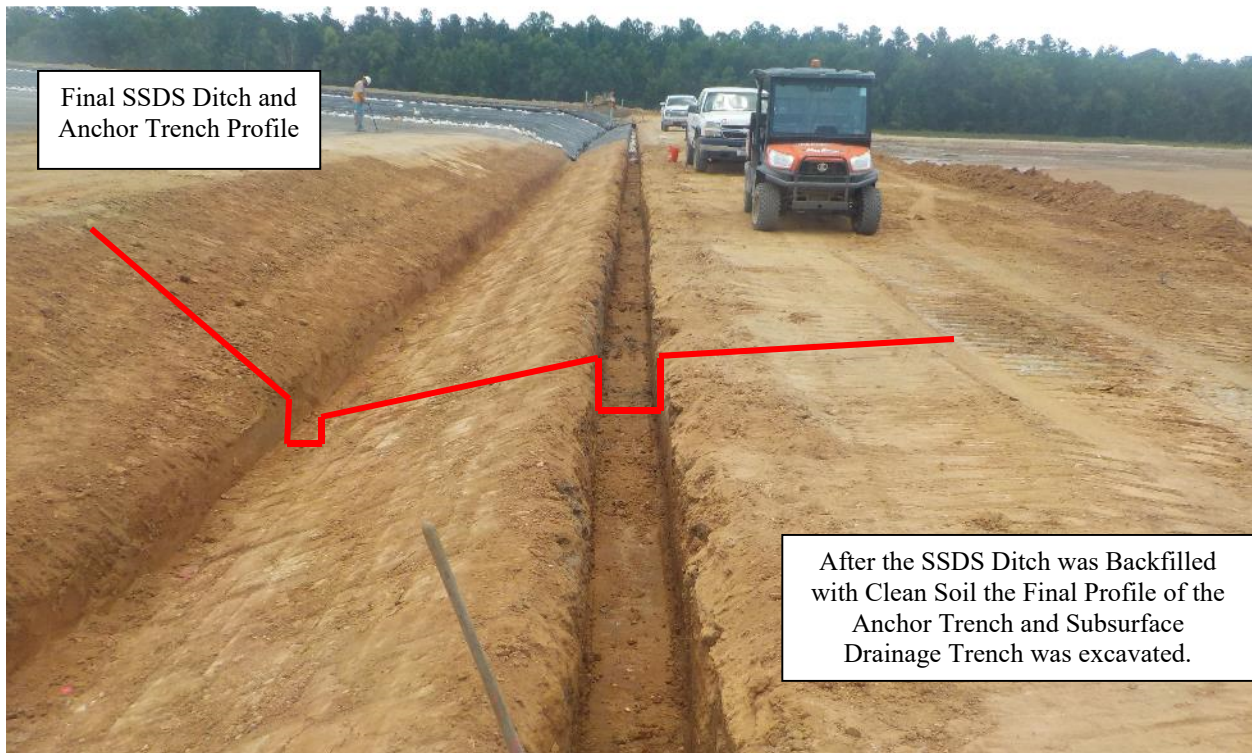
Final Excavated SSDS Ditch Profile and Anchor Trench
